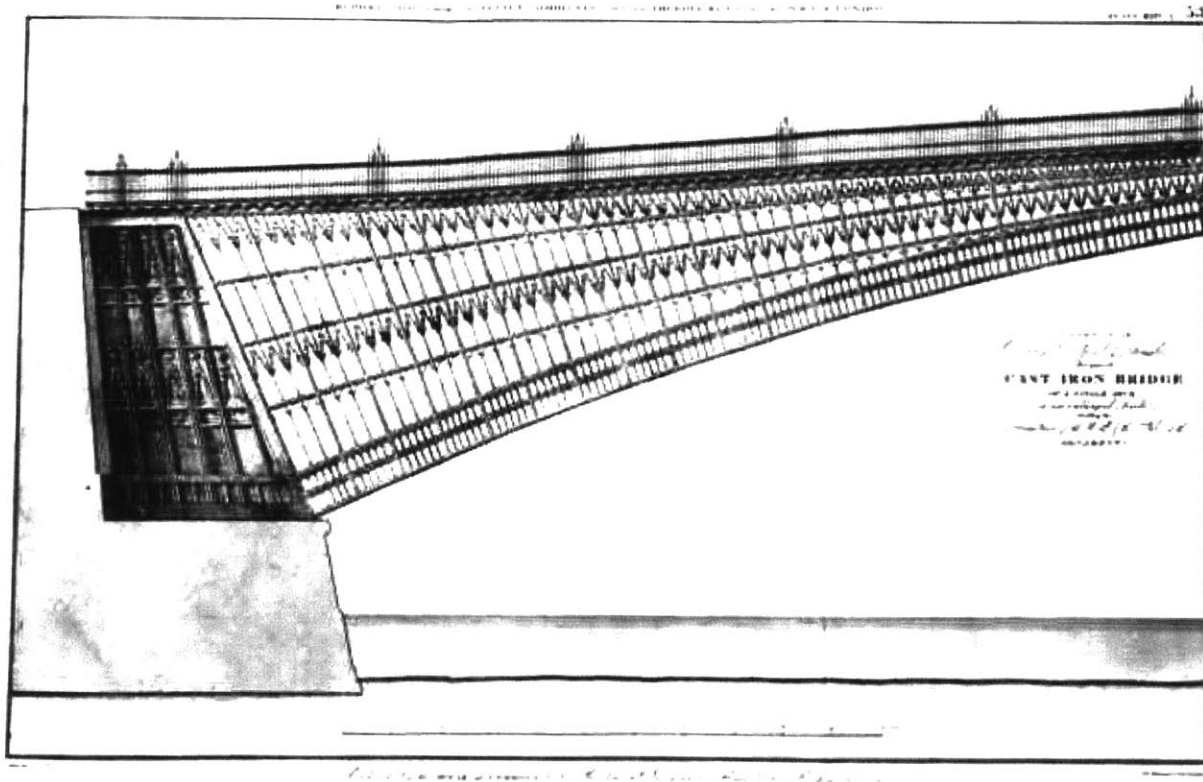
Proposed London Bridge design (Lowry 1801)
